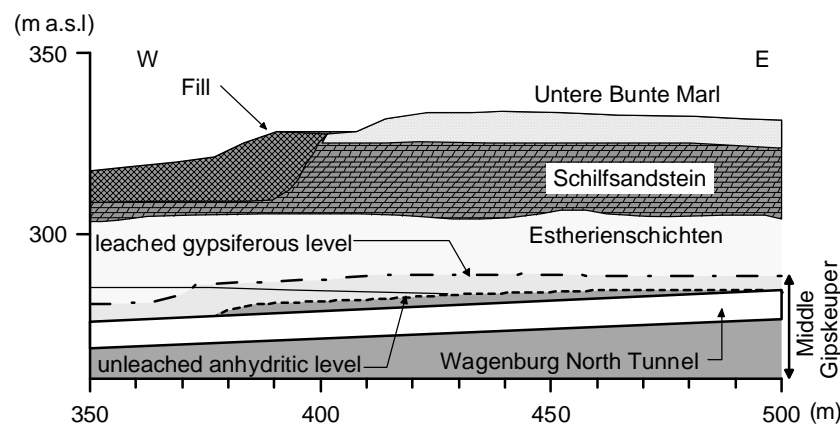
Geological longitudinal section of Wagenburg North tunnel in Stuttgart (Nagel, 1986; Paul & Wichter, 1996 and Amstad & Kovári, 2001)
